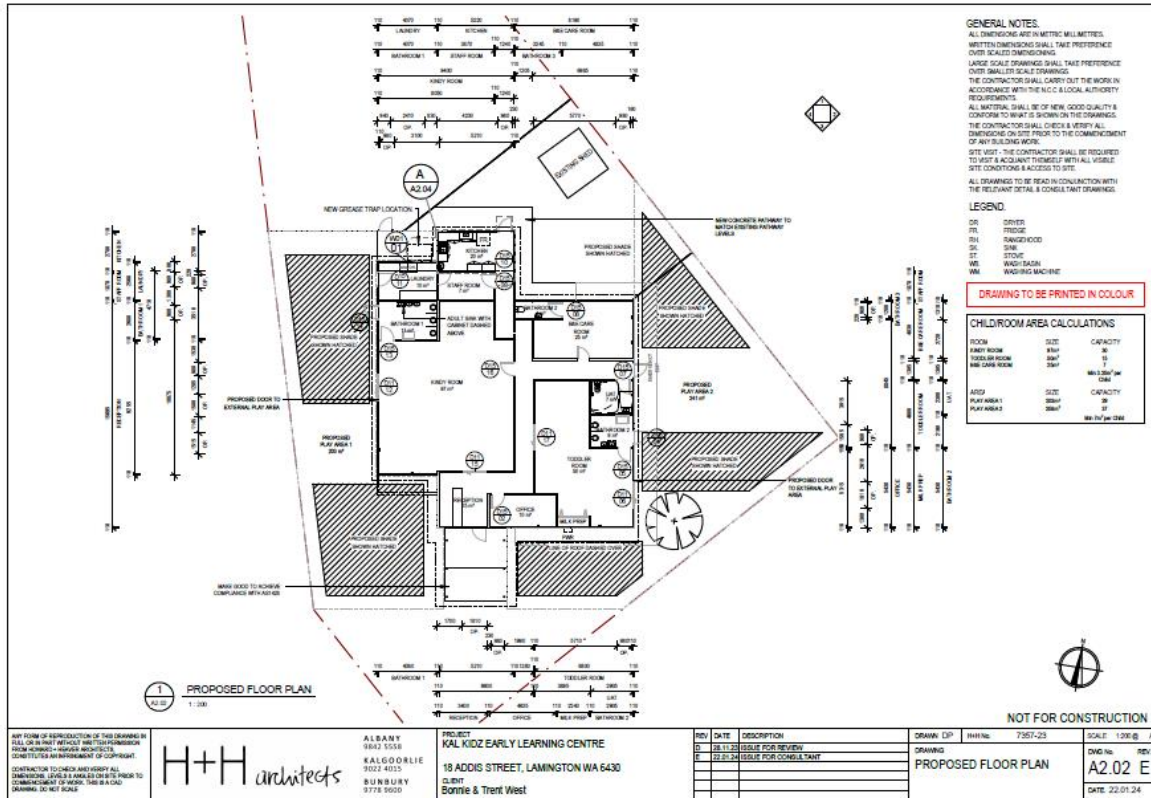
Proposed Floor Plan of No. 18 (Lot 4903) Addis Street, Lamington
